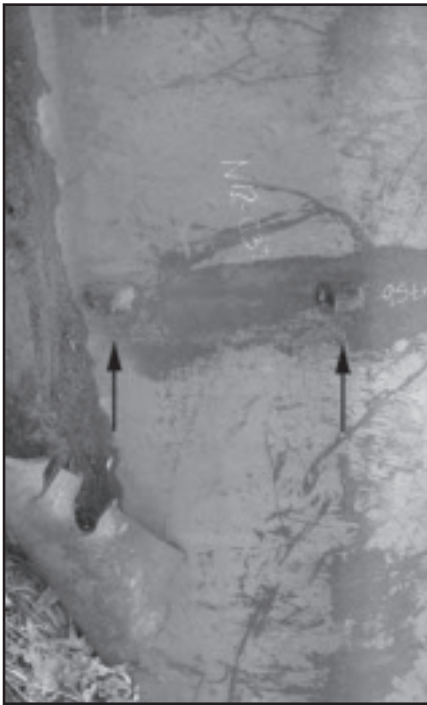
Example of strap connections without a gusset plate from a recovered exterior panel (A206: 92–95). Connection shown is on column 205 at the 95th floor. Portions of diagonal bracing strap that were directly welded to the spandrel are indicated with arrows
